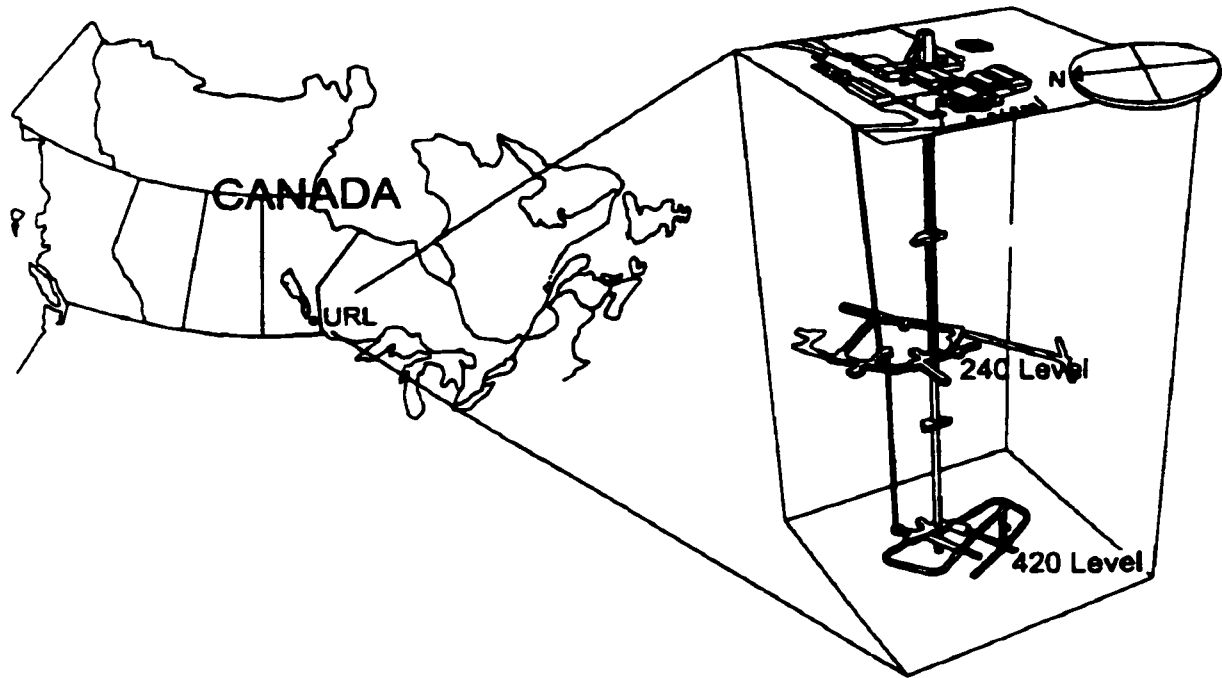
Location and underground layout of the Underground Research laboratory, URL (modified after Read and Martin 1991).
